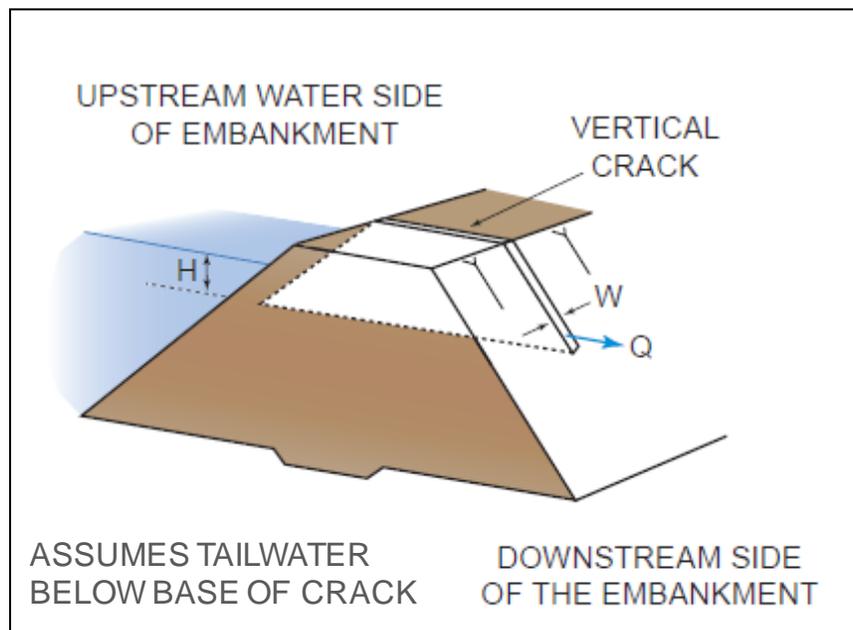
B-21. Vertical Parallel-Sided Transverse Crack Geometry (Fell et al. 2014)
